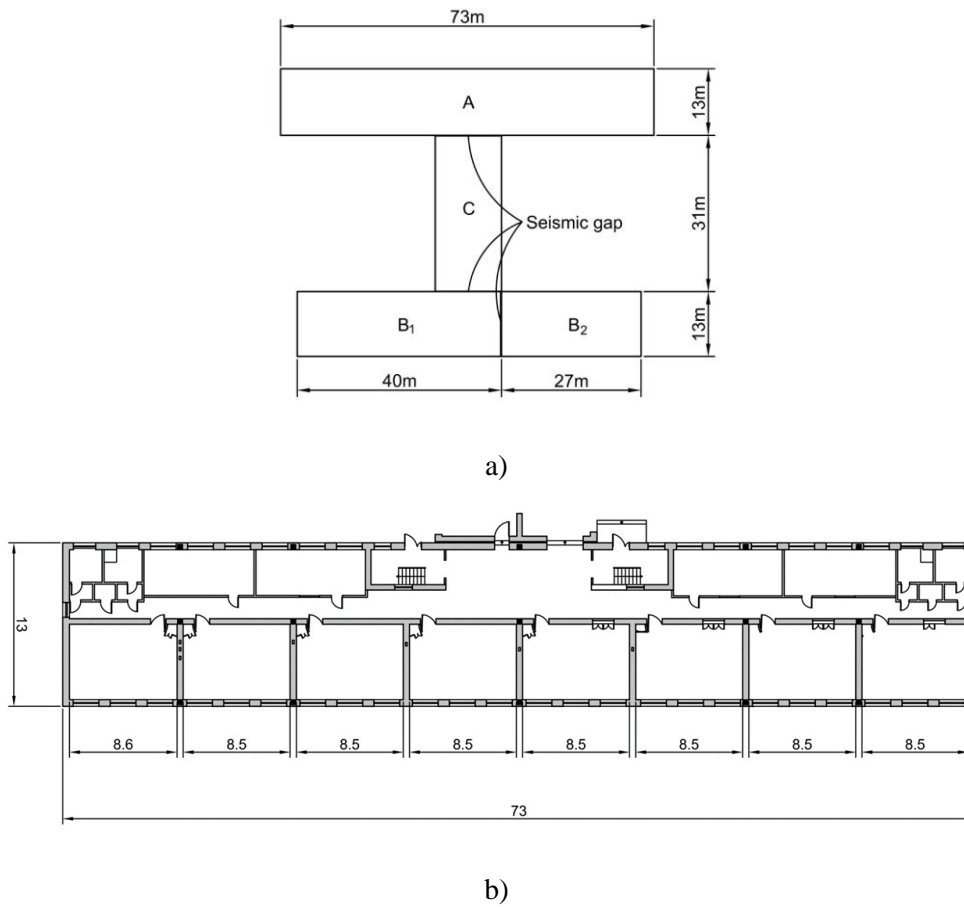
Masonry school case study: a) school plan showing building blocks separated by seismic gaps, and b) architectural plan for block A [1]
